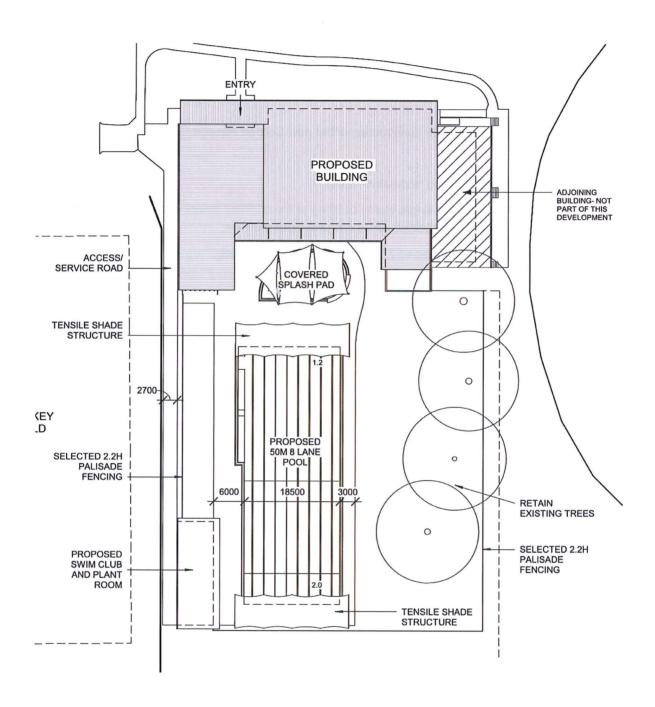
Proposed site plan for the Corowa Aquatic Centre
